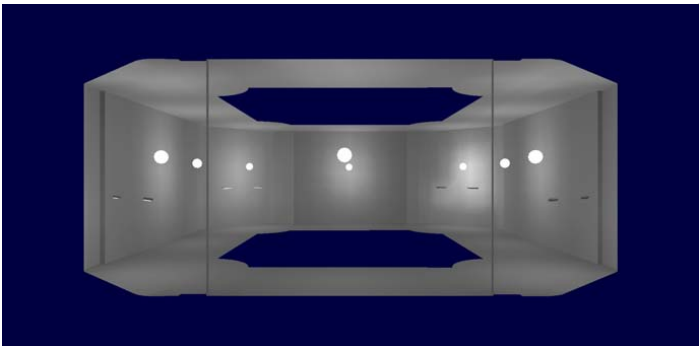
Lighting Calculation: Second Floor Rotunda
